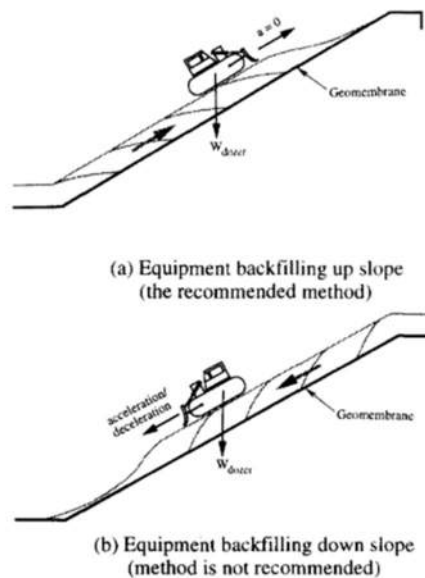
Construction equipment placing cover soil on slopes containing geosynthetics.
